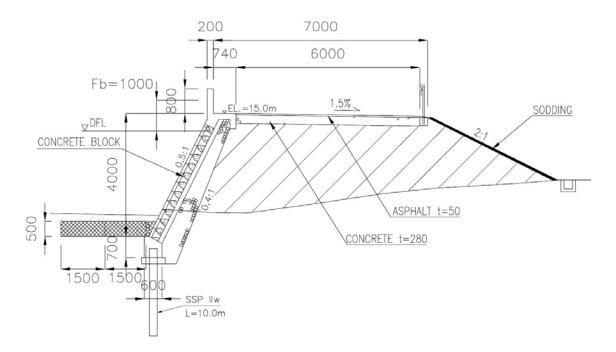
Standard Drawing of Concrete Block Wall
